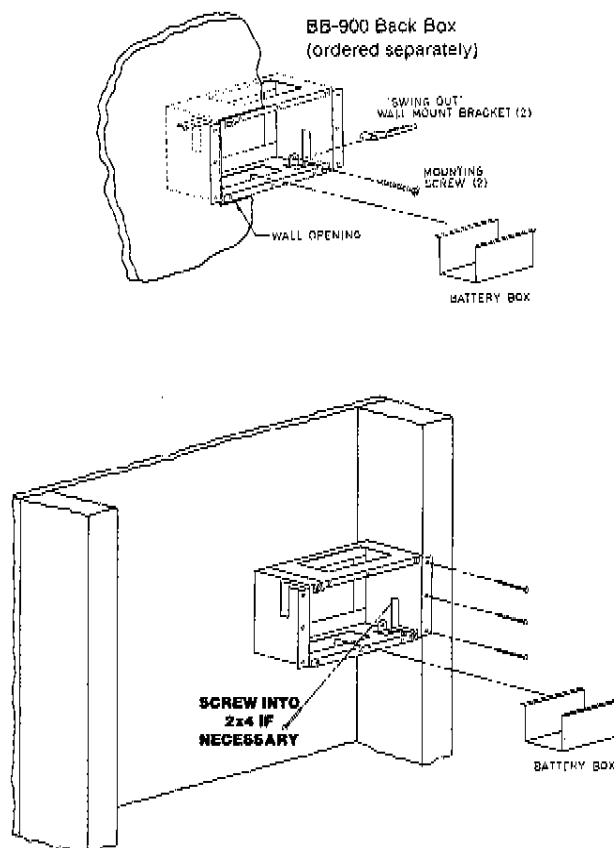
TYPICAL INSTALLATION LAYOUT
